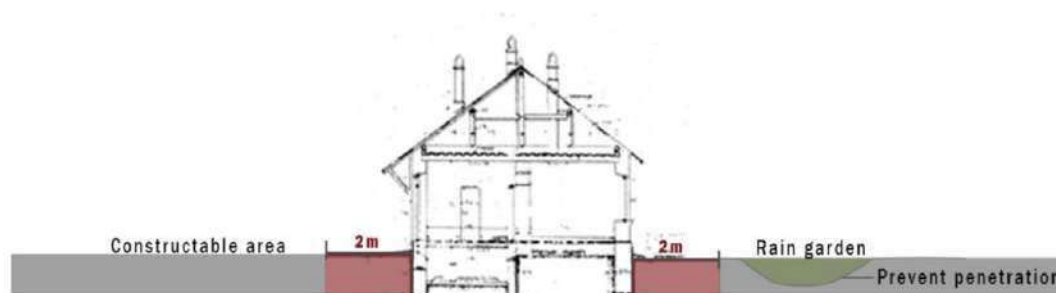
Illustration of avoiding Historic architectural foundation in Garden Street Historic Block
